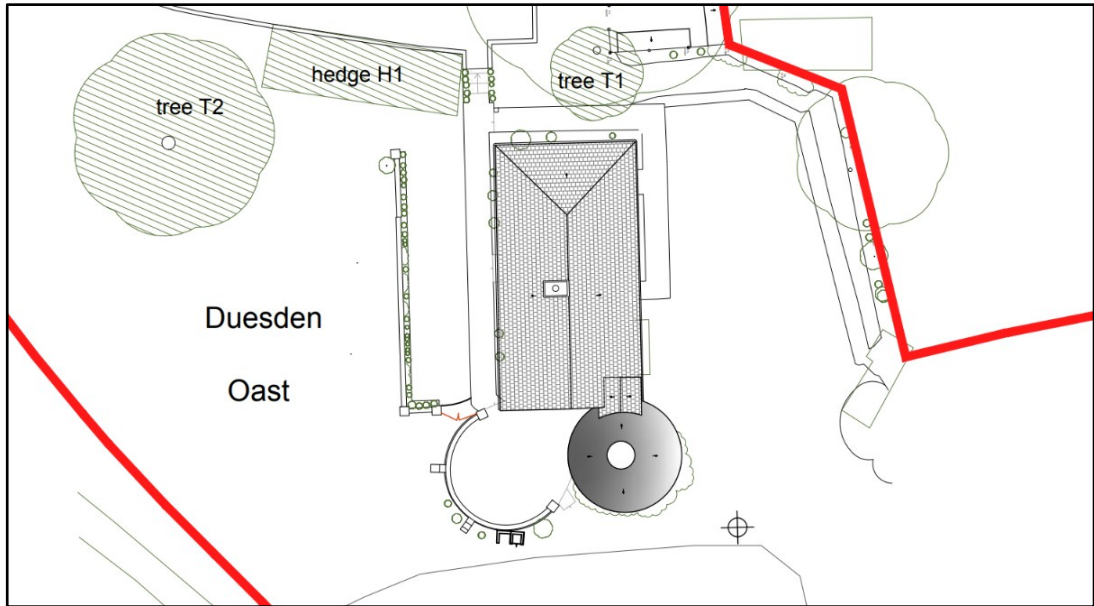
EXISTING SITE PLAN (AV ARCHITECTS)
